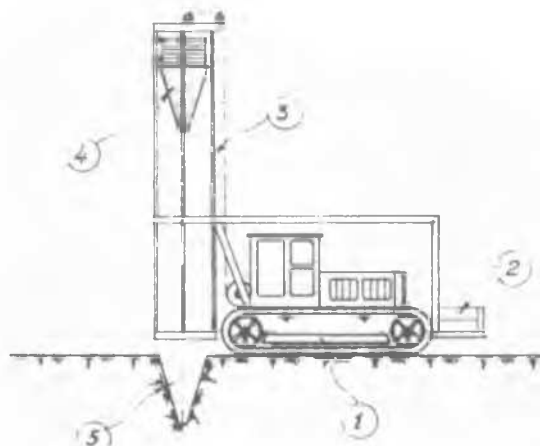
Scheme for pressing out the base to make the pile-footing: 1. bulldozer; 2, weight; 3, frame; 4. rammer; 5. base for pile-footing.
